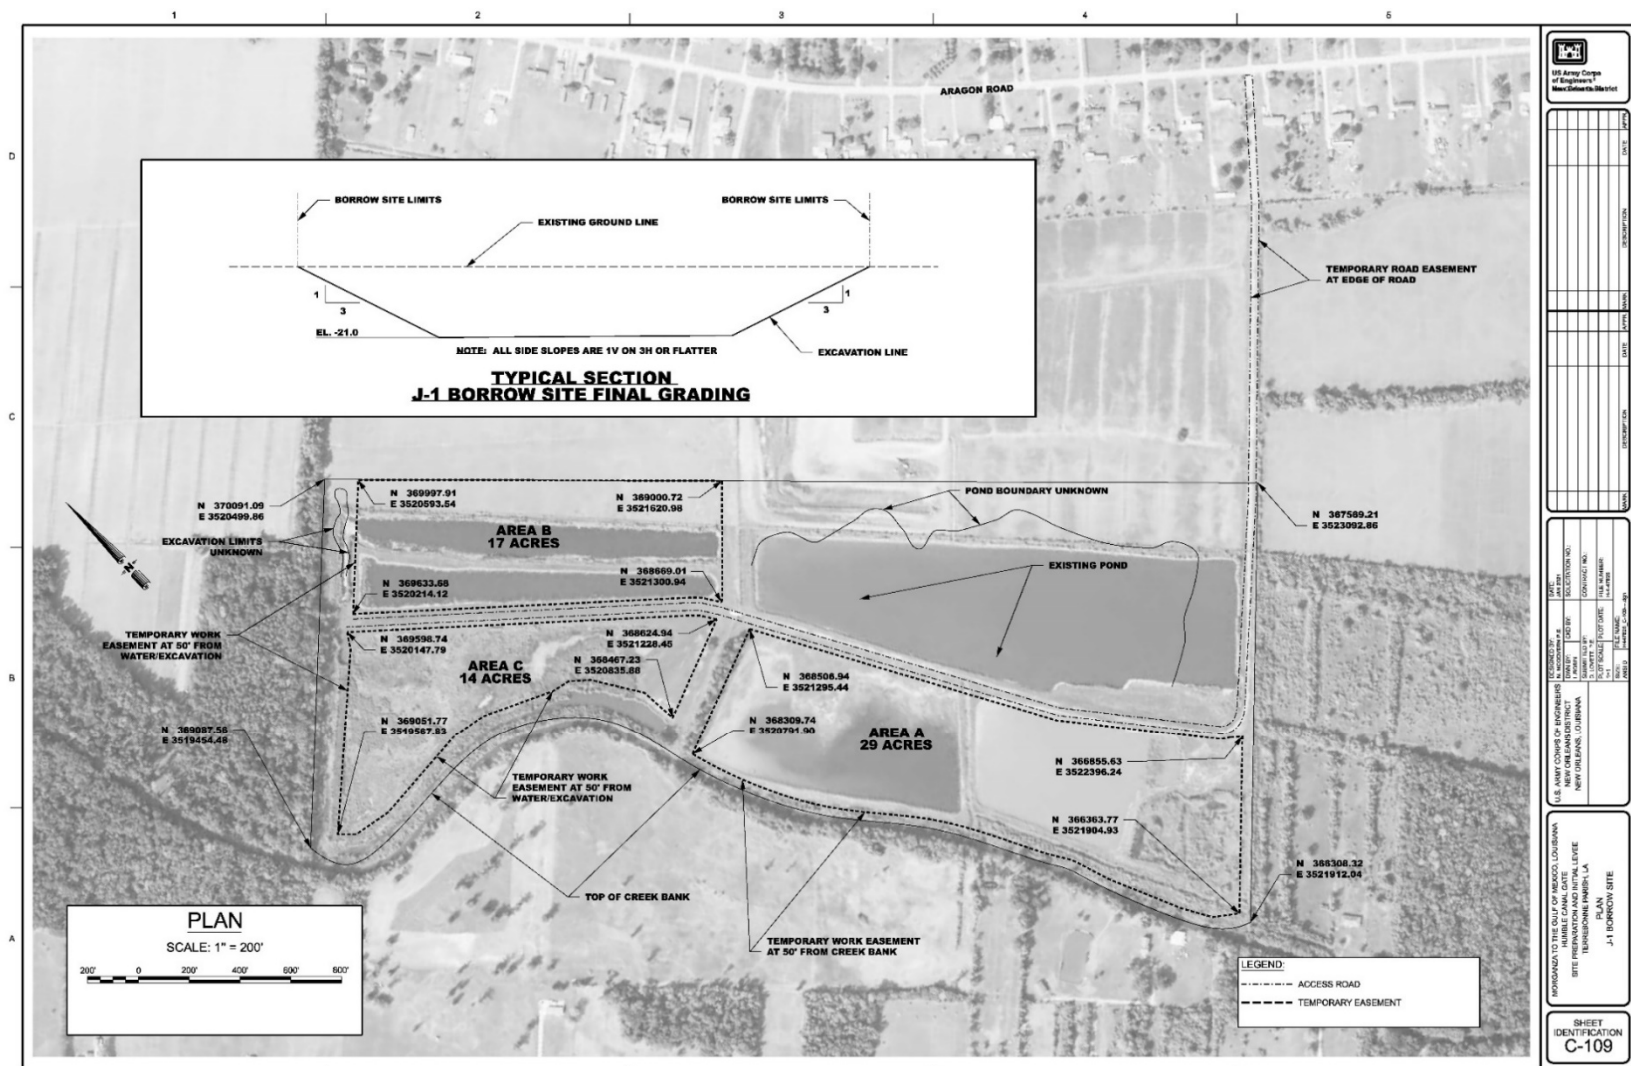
Borrow site plan sheet for Humble Canal earthen fill material
